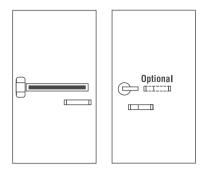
Door Guard Installed Closed (Source: Courtesy of Rockwood® Manufacturing Company)
